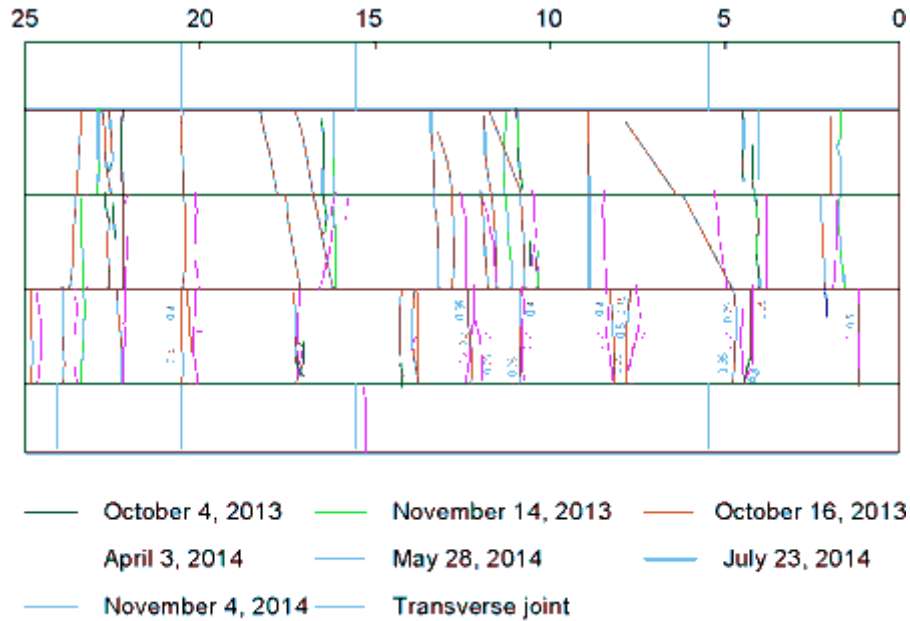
Cracks in concrete slab, section 0 to 25 (Steel)
